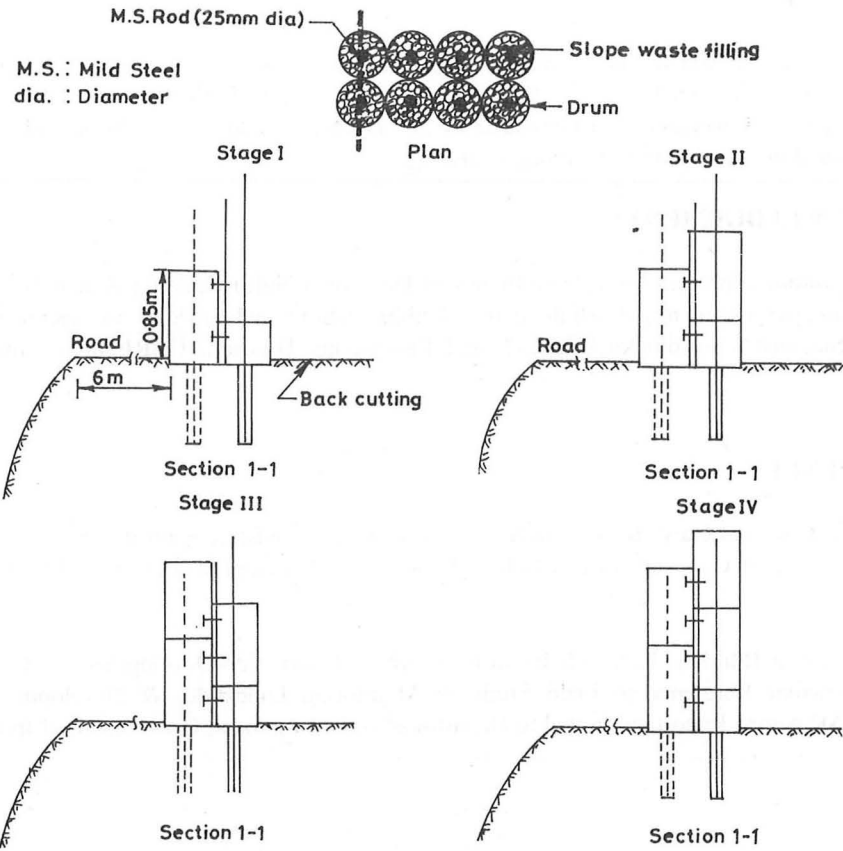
Sequence of construction of anchored drum diaphragm wall
